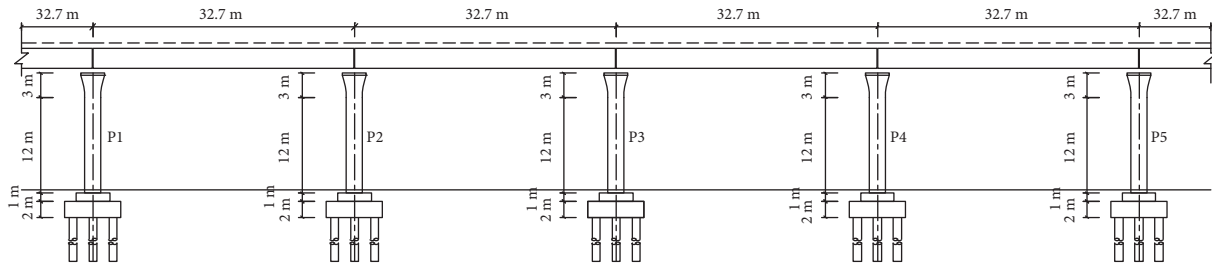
Longitudinal section of a multi-span simply-supported beam.
